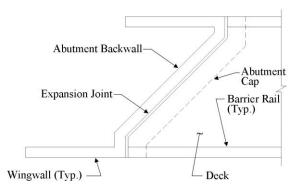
Breakback detailing to eliminate skew effects associated with detailing acute corners at ends of skewed deck slab (8).
